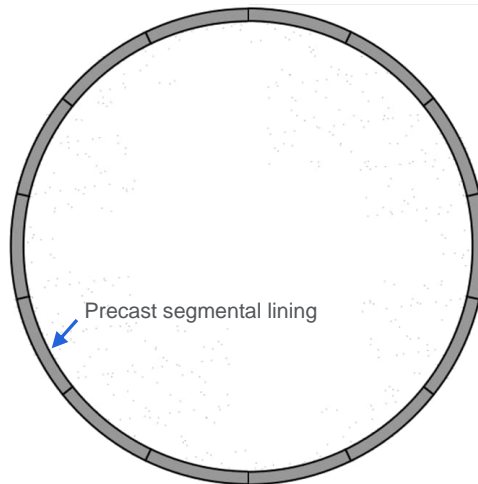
Schematic plan view of completed shaft with precast concrete segmental lining
